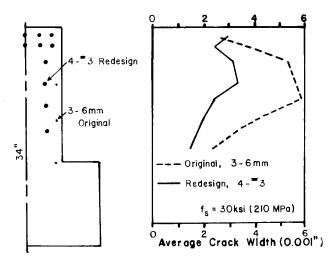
Crack profiles, original and redesigned beams (1 in. = 25.4 mm)
